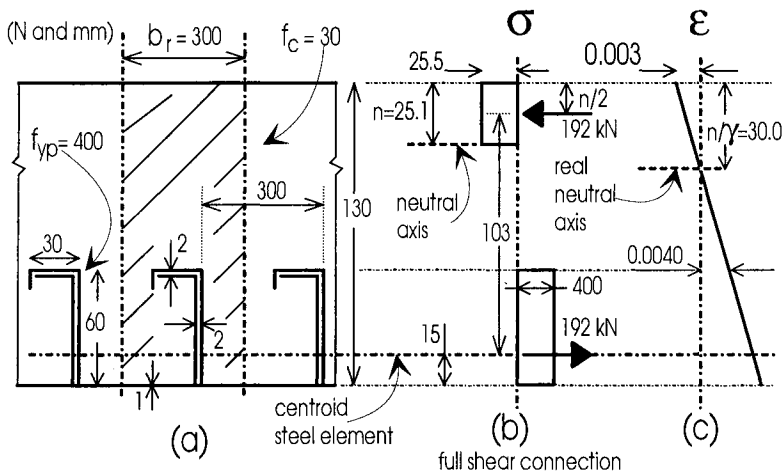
Example 16.2: Concrete slab with shallow profiles
